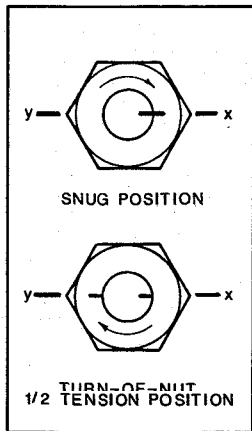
A mark on the wrench socket is aligned with felt marker line x and nut is turned until the socket mark reaches line y. Note felt marker line on nut in snug position extends into the bolt to assure the inspector that the bolt has not turned.
